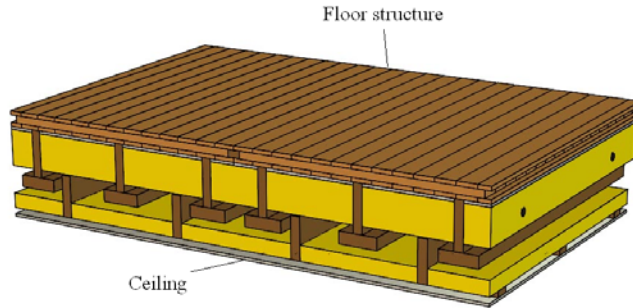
This is the floor element, floor structure and ceiling, made by *Martinsons Byggsystem AB*. [13]
